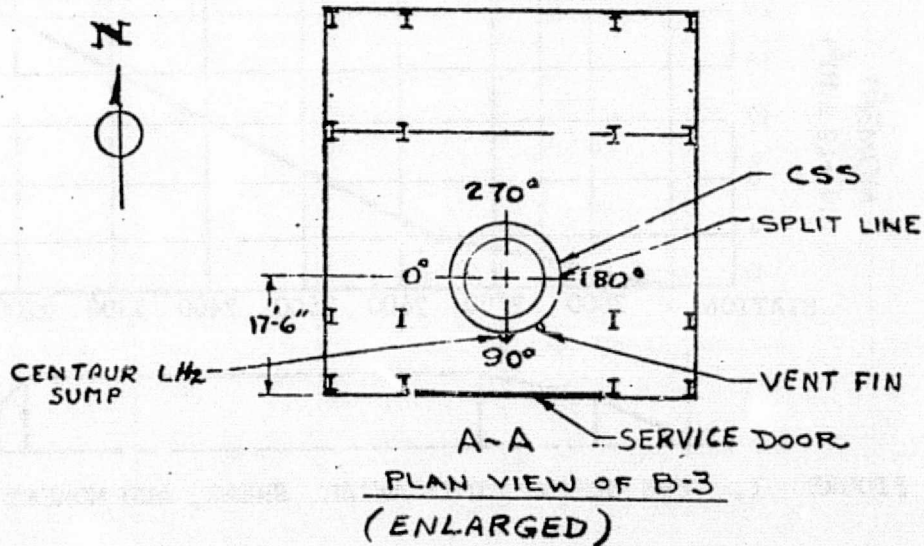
B-3 FACILITY TOWER STRUCTURE.
